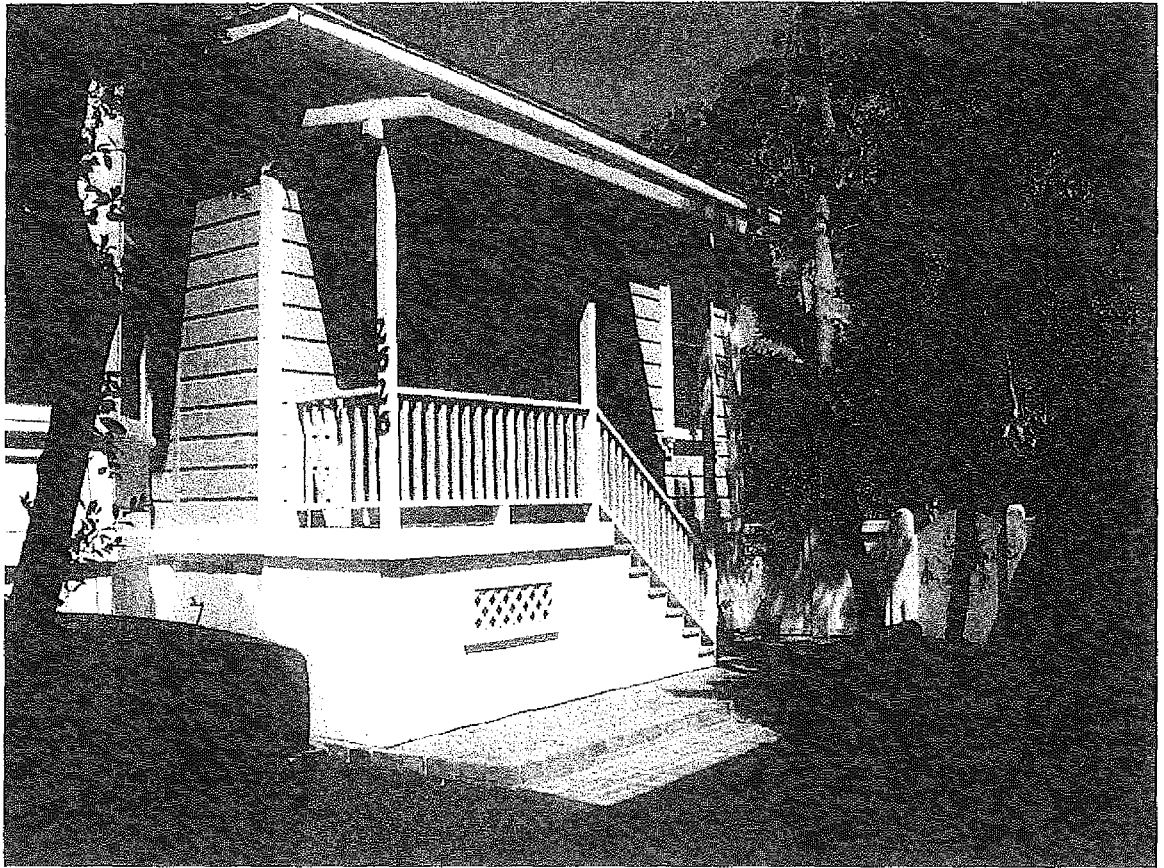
South side porch and steps. Original house may not have had a south side entrance (see text). This was built in 1989-91 when rear apartment was renovated to provide a rear entrance for what was then the back apartment.
